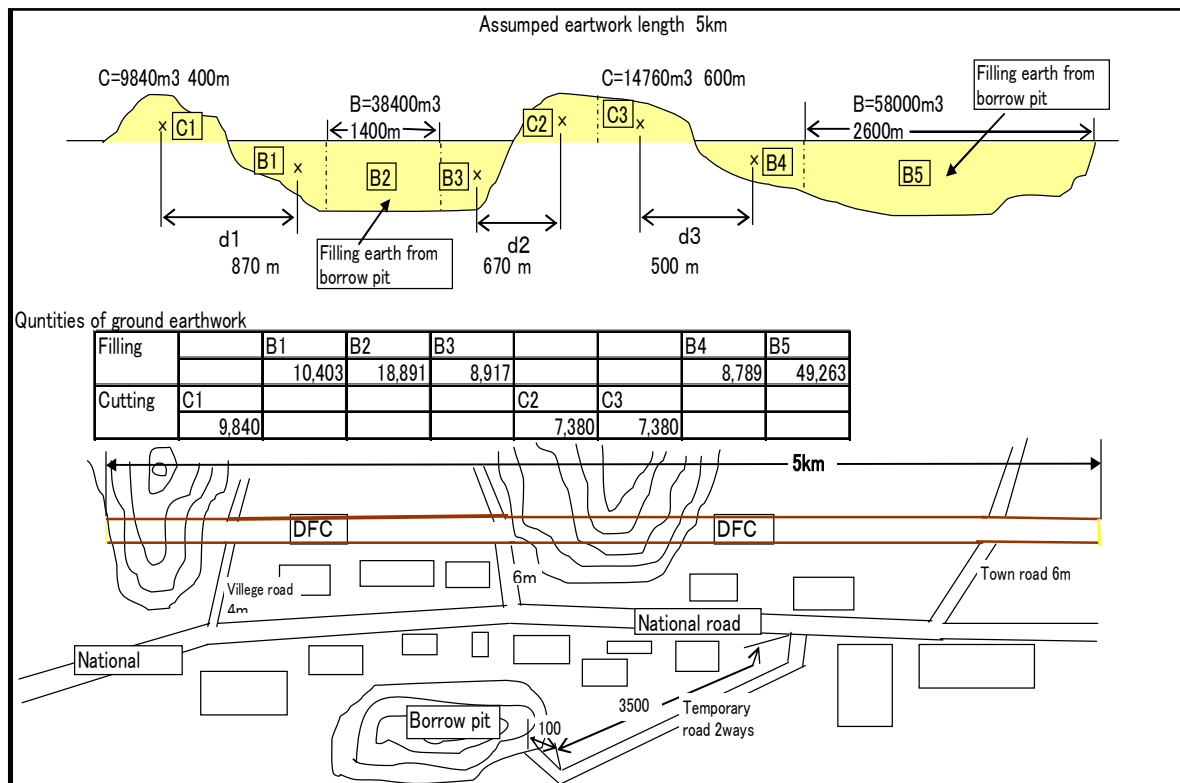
Assumed Earthwork Plan and Profile (5 km length)
